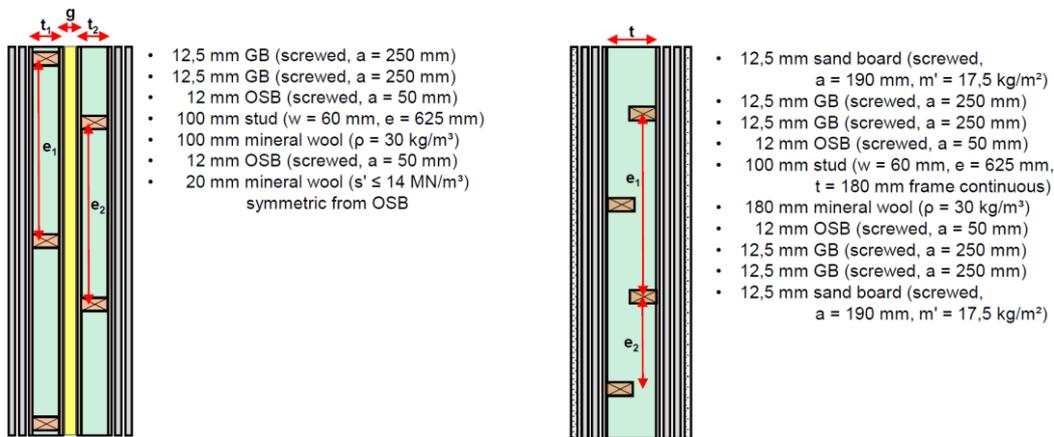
Left: Construction details of an investigated symmetrical double wall, made of two single walls with insulated gap between walls. Right: Construction details of an investigated symmetrical wall with separated studs. Note that the studs are separated from one side, but the framing (top/bottom/left/right beam) is continuous from one side to the other. GB: gypsum board (fire resistant); t : thickness of the cavity; g : gap width between the single walls; e : distance between the stud centers; a : distance between the screws; w : width of the stud; s' : dynamical stiffness; ρ : bulk density
